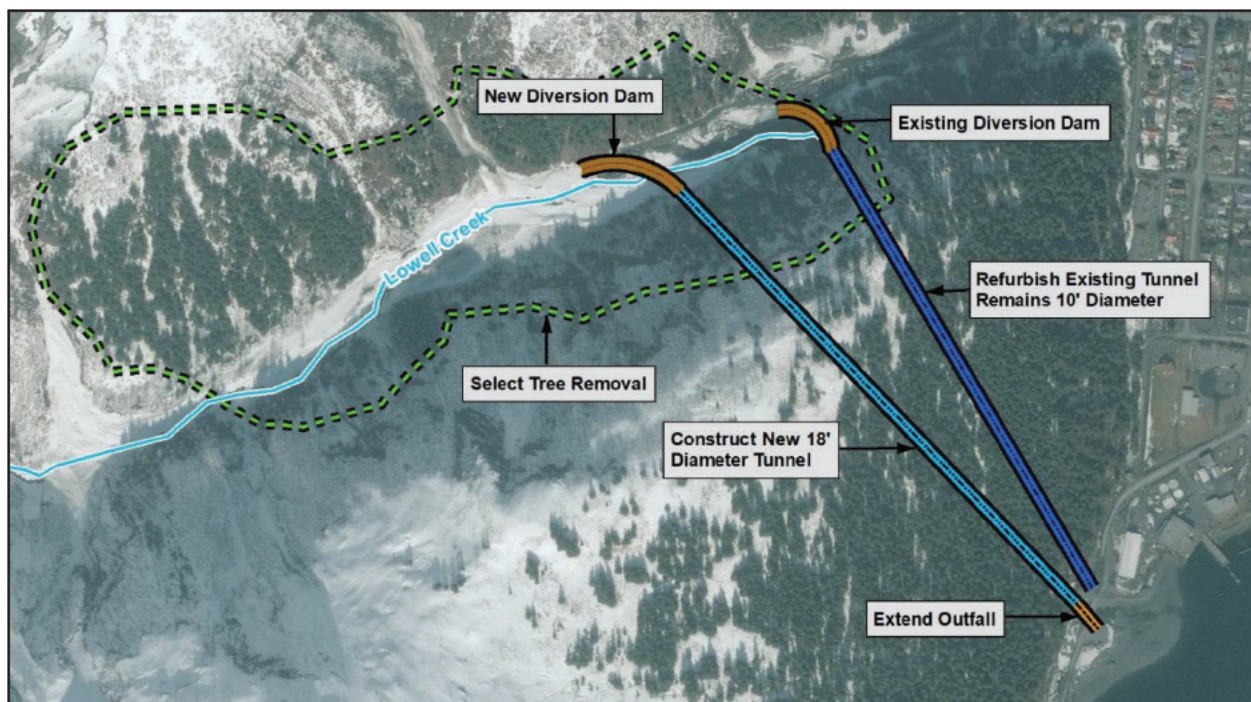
Alternative 4A: Construct New Flood Diversion System with 18-ft-Diameter Tunnel.
